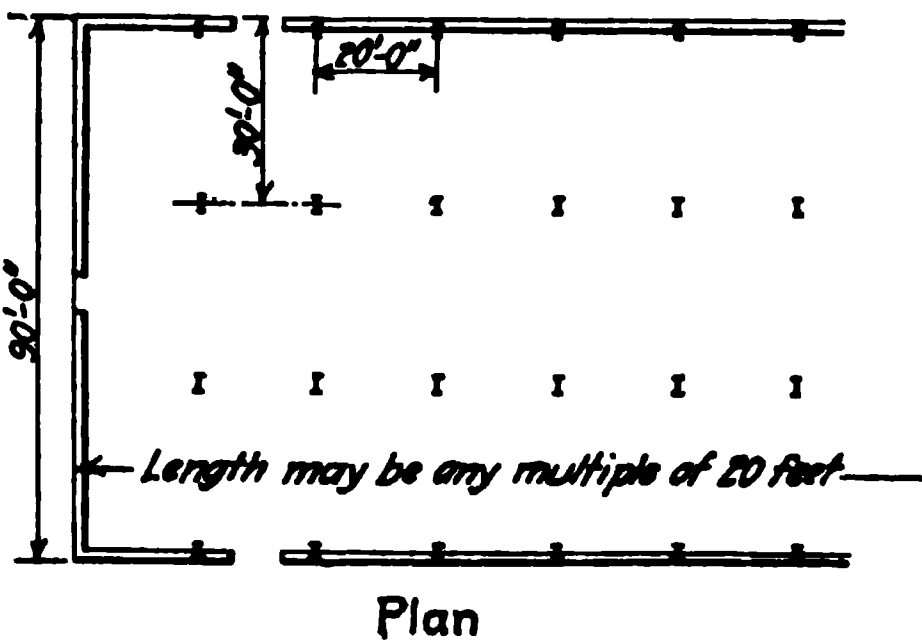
shows Austin No. 1 Standard Building. The cross section of the building and plan are almost self-explanatory. This building is very similar to "The Miracle" type building as constructed by the Crowell-Lundoff-Little Company of Cleveland, Ohio, the difference being mostly in points of detail. This building is also similar to Type E as designed by Ballinger and Perrot of Philadelphia, the chief difference being in the addition of a monitor for lighting and ventilating purposes. This building is ideal for small machine and assembly shops, carpenter and pattern shops, paint shops, storage, light manufacturing or laboratories. An important point in the design of this and other types of standard buildings lies in the fact that the steel beams or trusses overhead should be made amply strong to support all ordinary shafting loads.
